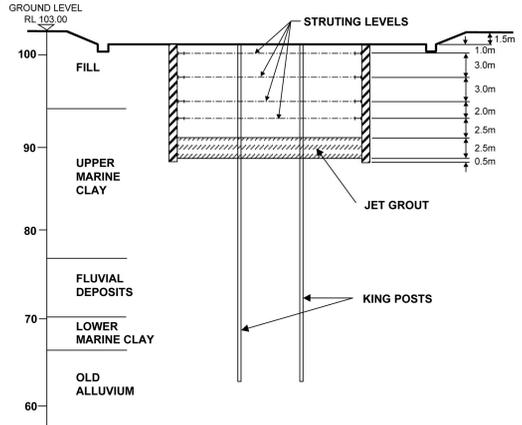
The excavation for the Central Services Tunnel (after Lim & Tan (2003)).
